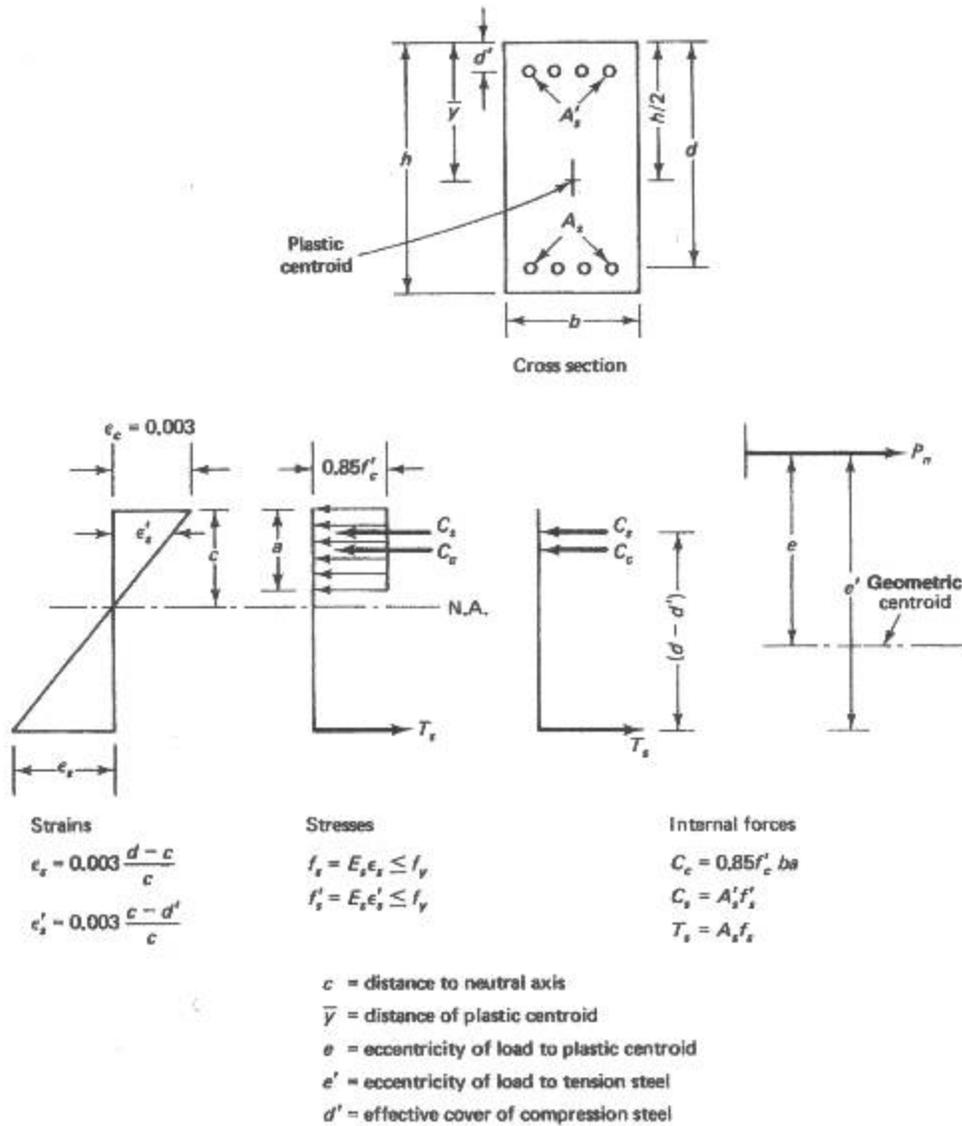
Stresses and Forces in Pile Section (Navy 2000)
